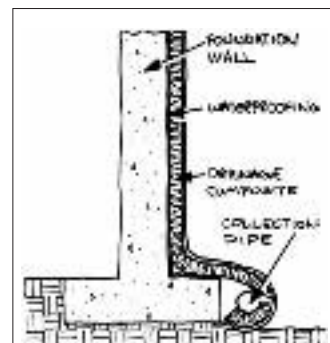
Geocomposites can be used to carry water down the drain tile and eliminate hydrostatic buildup against the wall.
